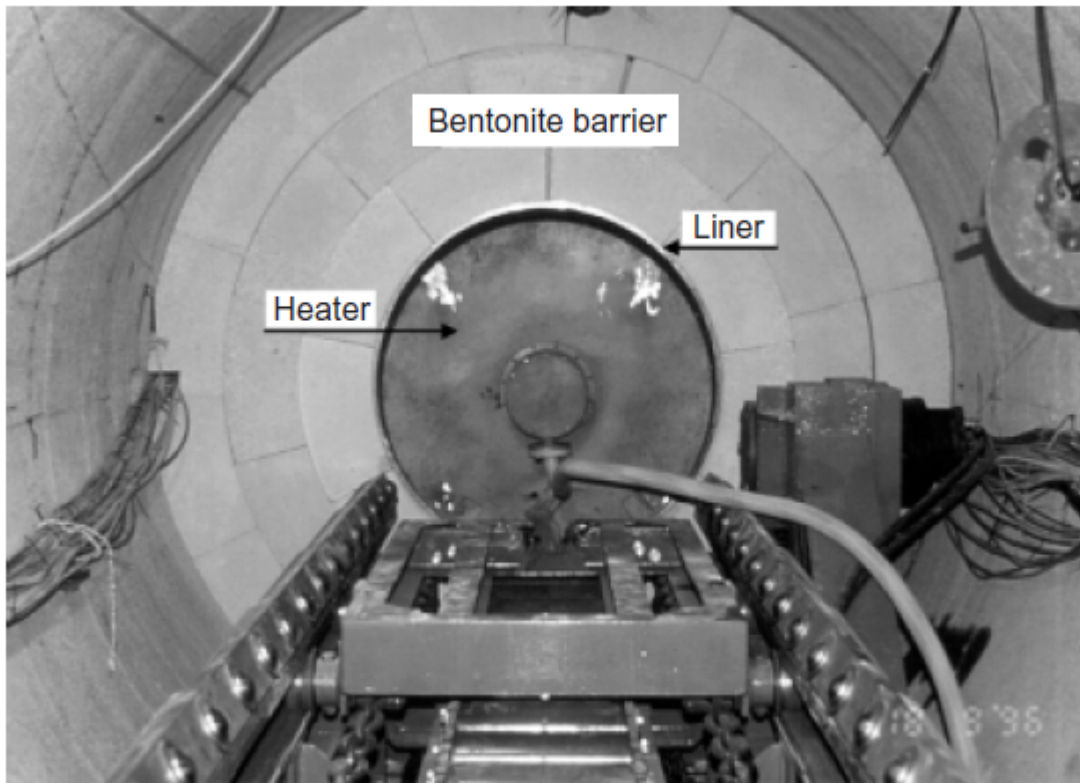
Heater placed in the excavated tunnel surrounded by compacted bentonite blocks (Gens et al 2009)
